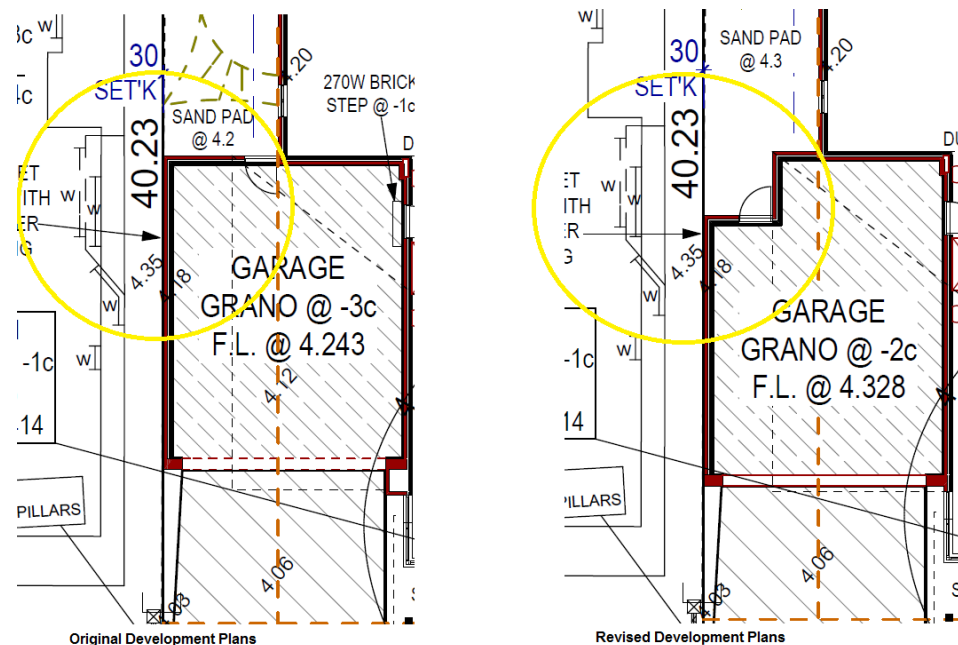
Comparison of original and revised development plans, showing the amendment made to the boundary wall as part of the garage.
